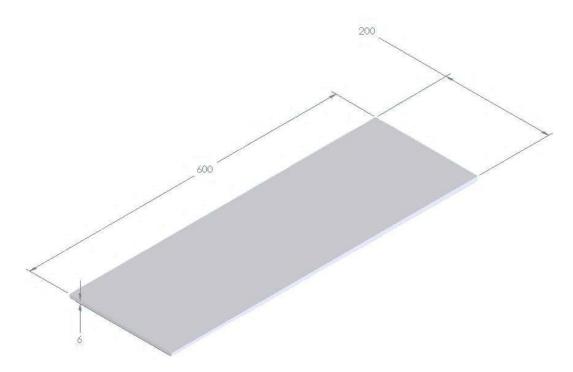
Three Strand Cable Barrier: Soil Plate (dimensions in millimeters)
